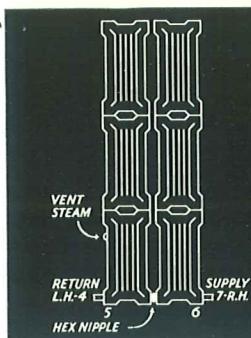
Assembled in two or more stacks. One and two pipe steam only. Bottom feed.
